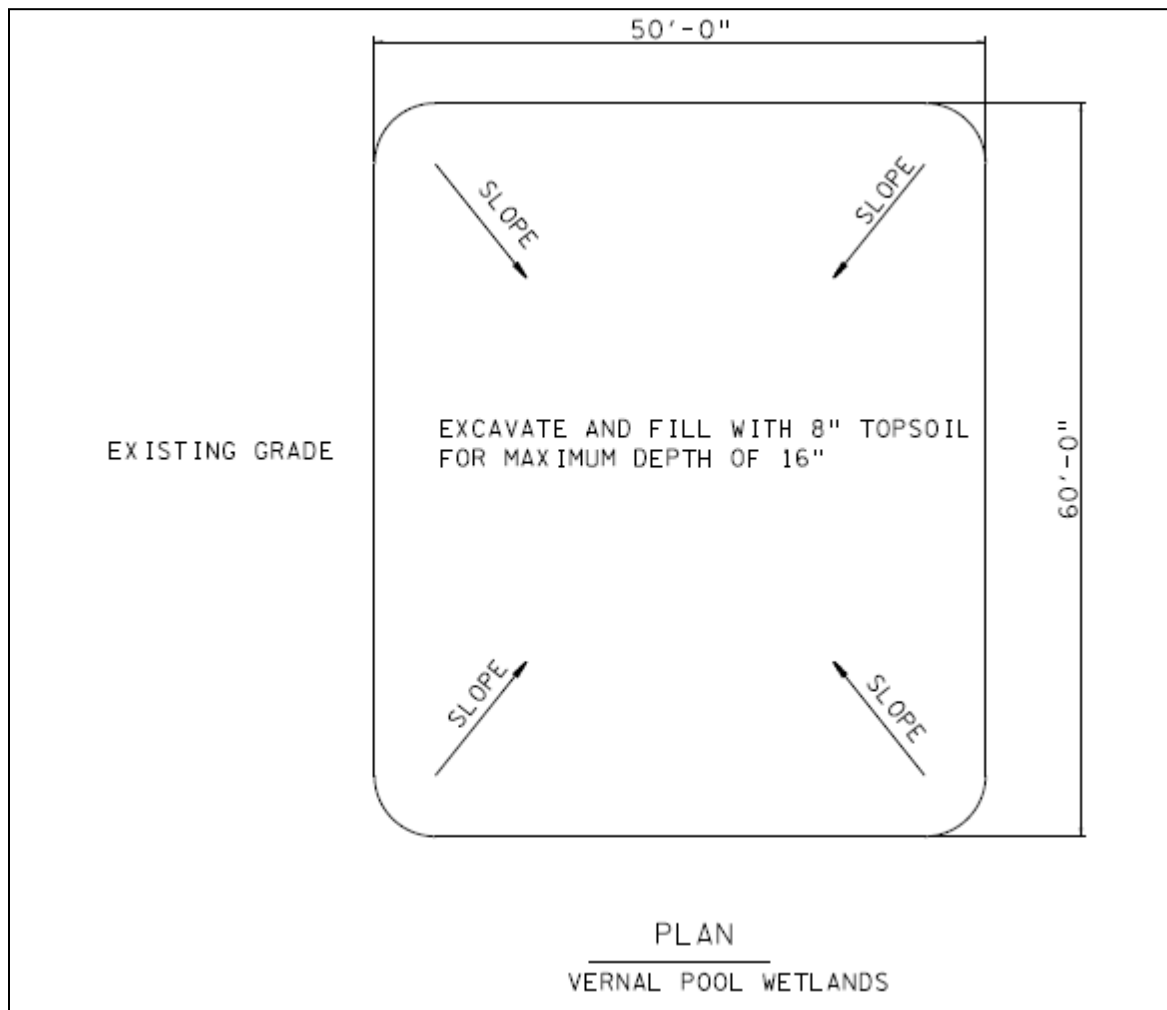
Typical Plan View of Vernal Pool Wetlands from NER Plan
